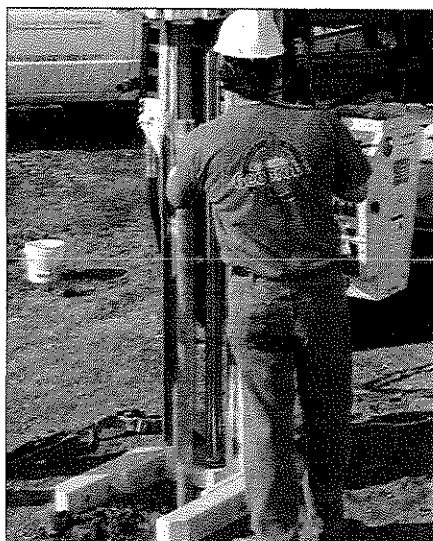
The sampler should be parallel to the probe derrick for driving.
